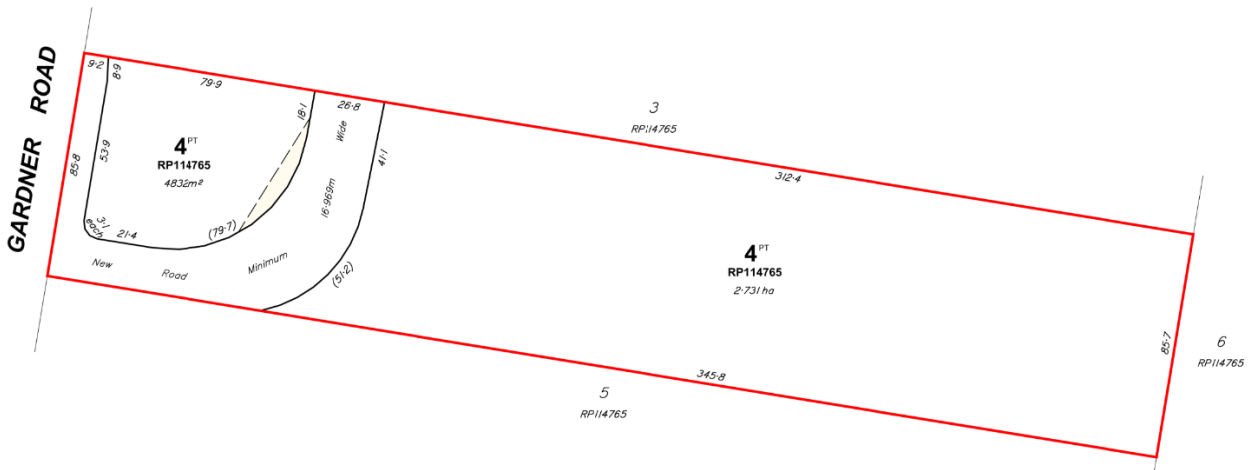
Plan of Reconfiguration by Wolter Consulting Group
